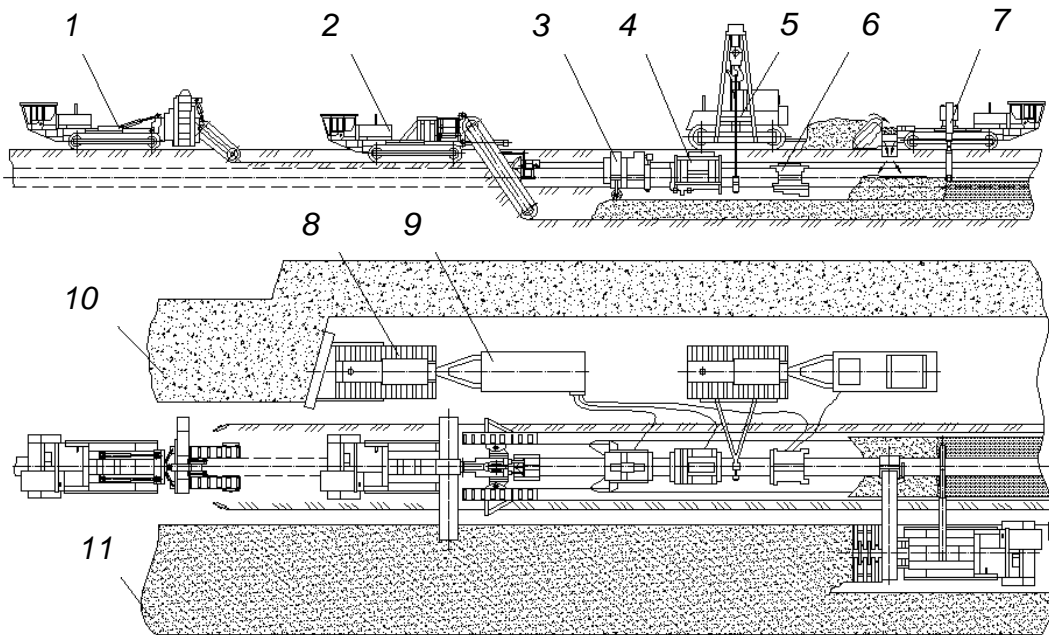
Technology of pipelines overhaul: 1 – machine of digging the ground by layers; 2 – pipeline uncovering machine; 3 – pipeline undermining machine; 4 – isolation removal machine; 5 – pipes-laying machine; 6 – isolation putting machine; 7 – machine for soil compaction; 8 – bulldozer; 9 – diesel power station; 10 – fertile ground; 11 – mineral soil
